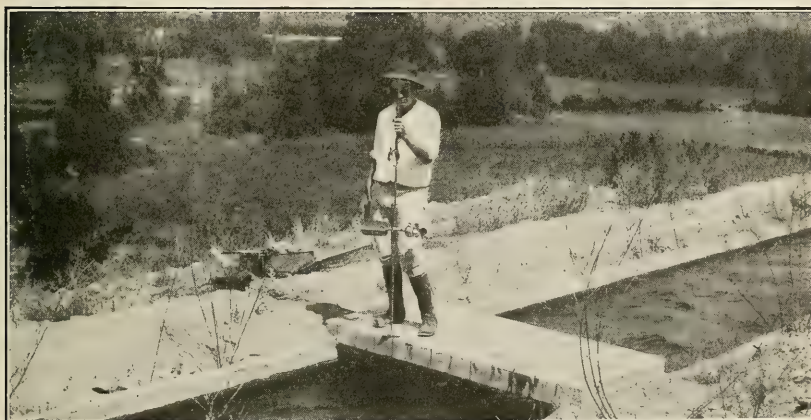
CURRENT METER STATION BELOW OUTLET TO PIPE NO. 42.
